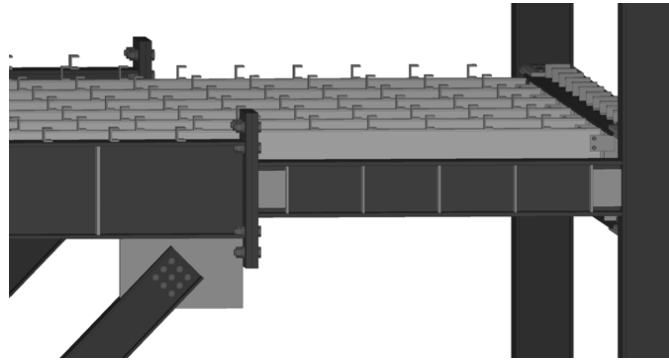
Proposing different section for link and beam outside of the link (Overall layout)
